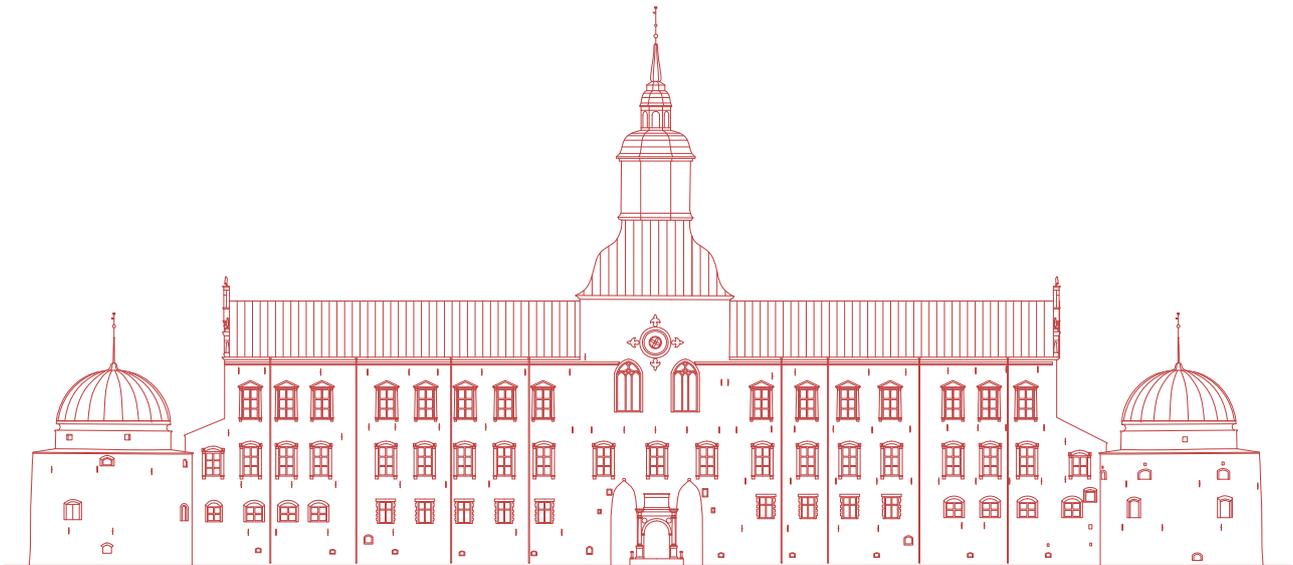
Elevation of the castle towards the park, 1:1000. The main facade of the castle is organized symmetrically around a centralized tower containing the entrance portico and a church on the upper levels, with two adjacent wings leading to the cylindrical defence towers. In terms of composition an overall harmony is achieved by a symmetrical disposition of windows, containing small alterations as the result of the internal layout.
